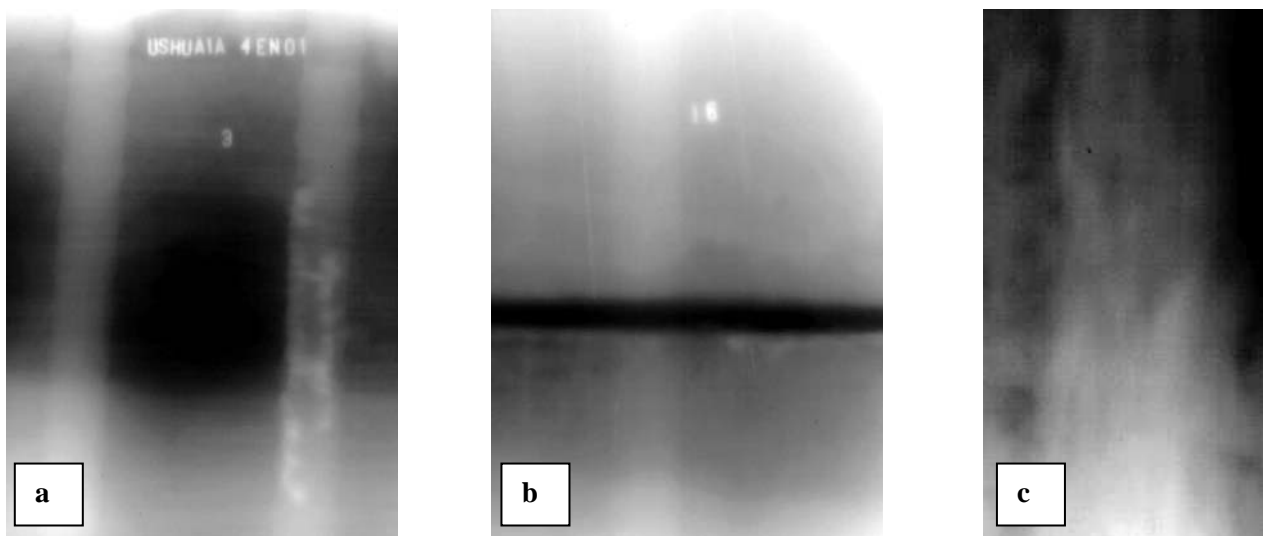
a) A plate obtained at sea level showing two 32 mm rebars. The one on the right is damaged with incrustations and corrosion; b) A plate obtained at about 30 cm above the seabed, showing a crack in the steel sleeve; c) Case of corrosion with part of the bar vanished.
